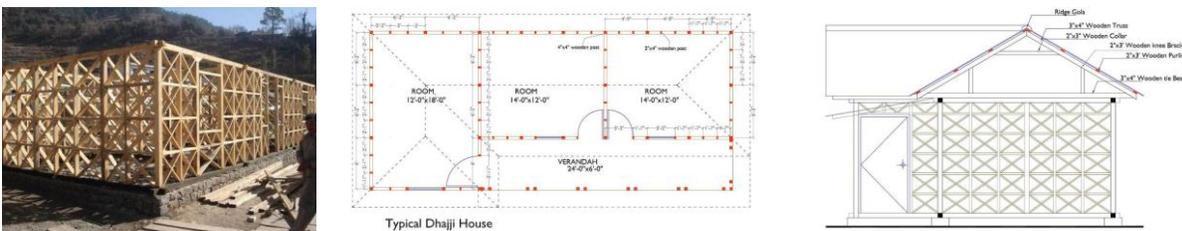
"Engineered" Dhajji building frame under construction in Pakistan.
